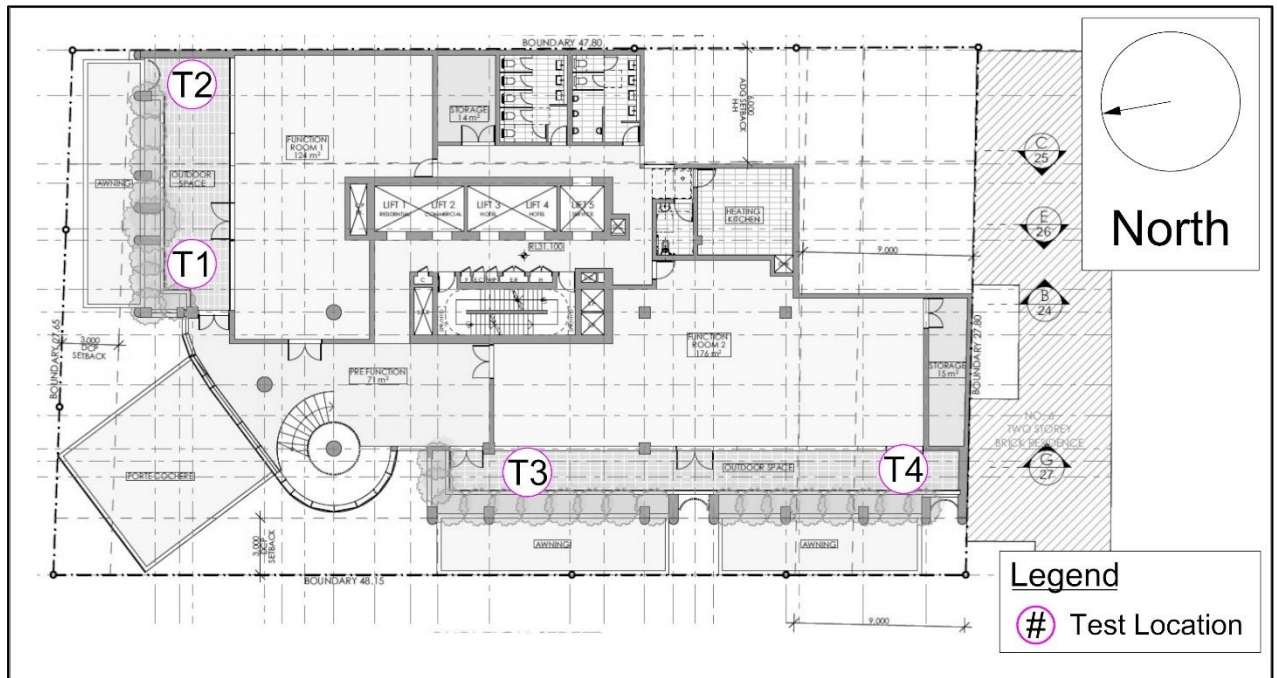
Ground Level Test Locations in the surrounding streetscapes for the proposed 2-4 Burleigh Street and 20-24 Railway Parade Development.
